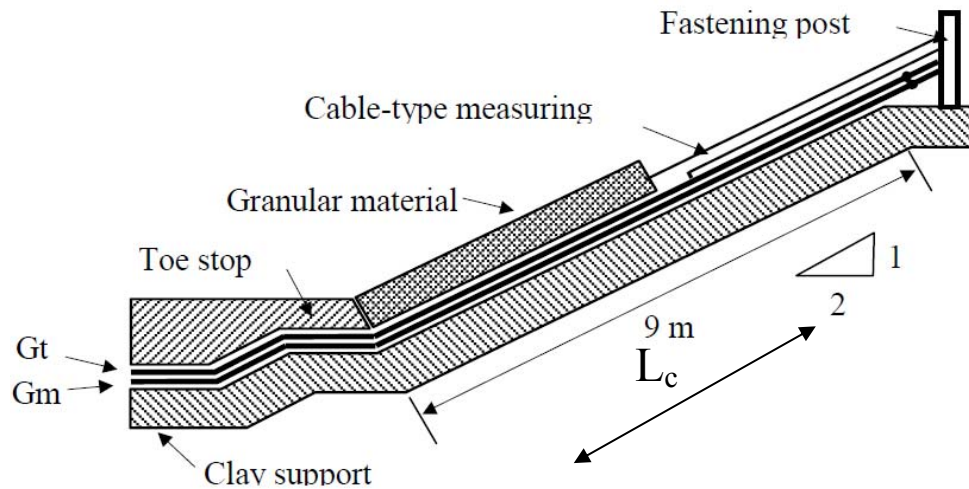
Monitoring on a slope barrier of the Montreuil landfill (Gourc et al. 2004)
